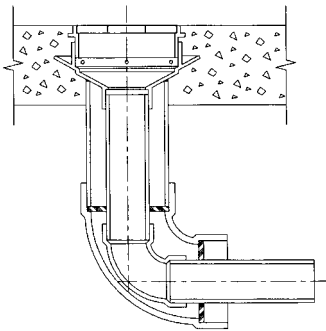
Example of a thermoplastic double containment floor drain with factory pre-assembled 90° elbow outlet. (*Orion Fittings, Inc.*)
